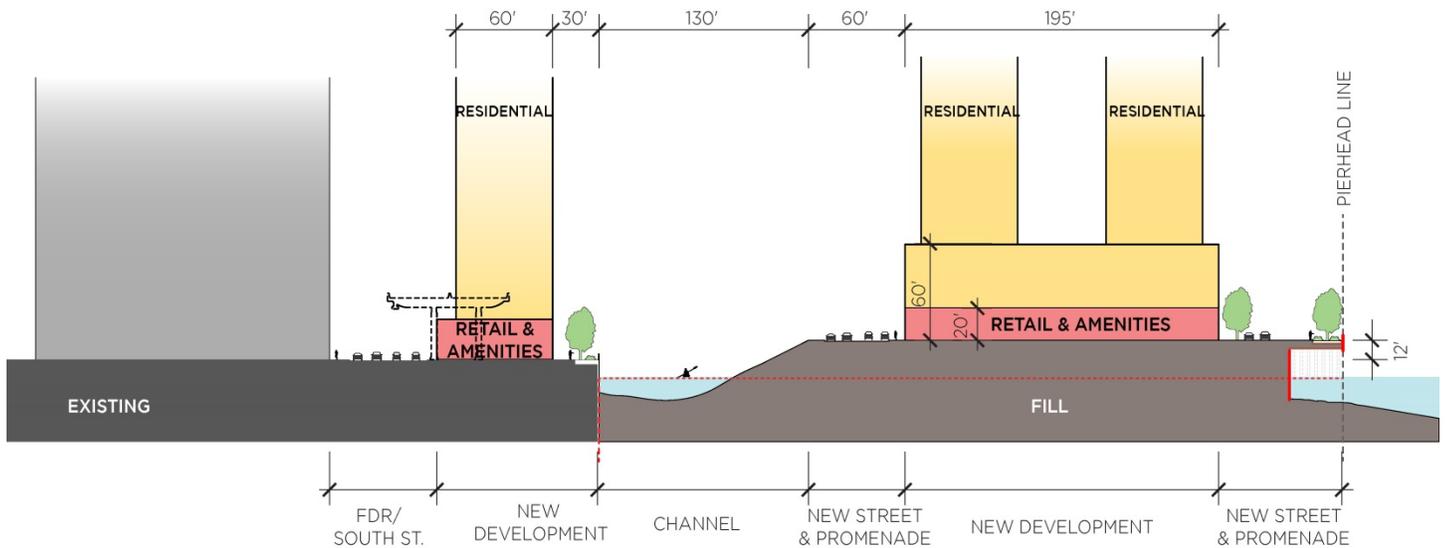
250' Land Reclamation with Secondary Channel option (full build out): Example section view²⁷
